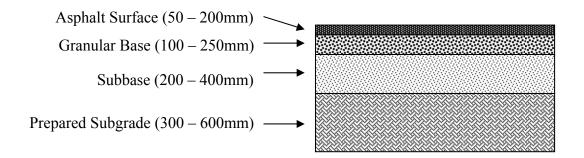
Typical Conventional Flexible Pavement Structure Composition and Layer Thickness (Reproduced from Asphalt Institute 2007.)
